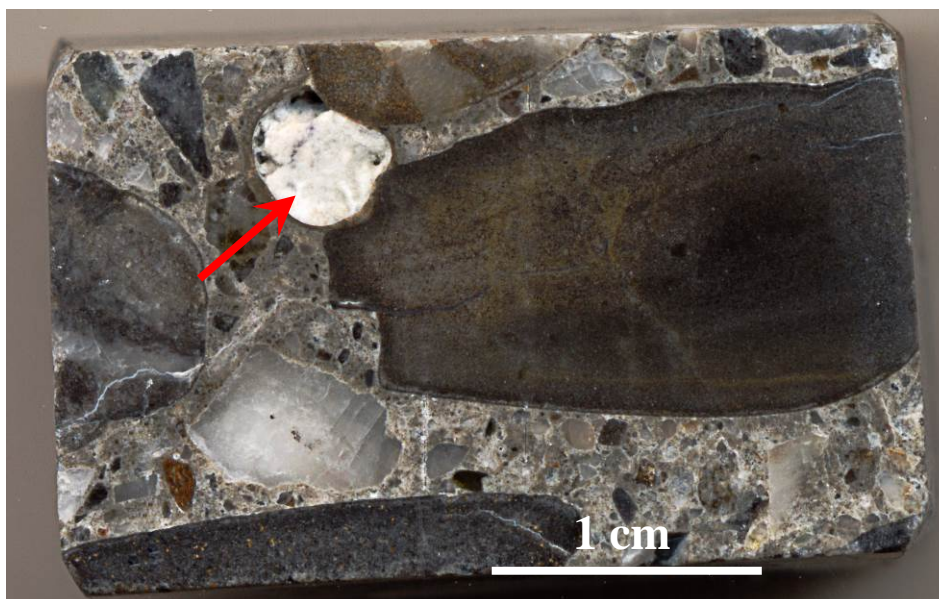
Deposit of white, silicon-rich product in a void of the cement paste. Concrete from a bridge. Image made with a flatbed scanner.
